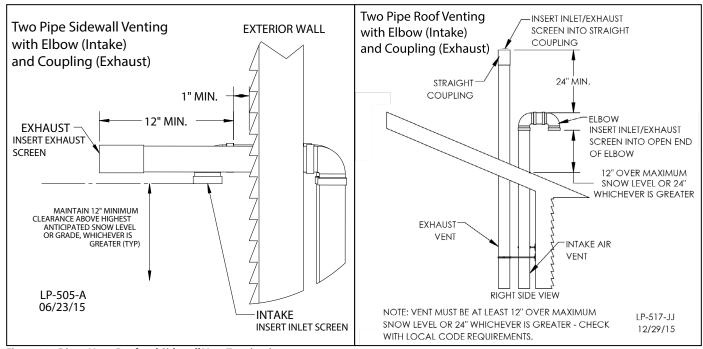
Direct Vent, Roof and Sidewall Vent Terminations
